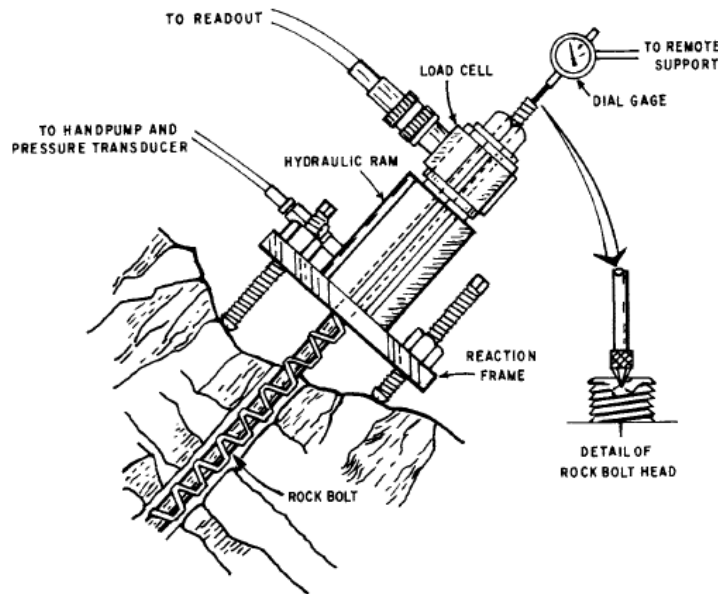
typical rock bolt pull test schematic (ASTM, 2008)
